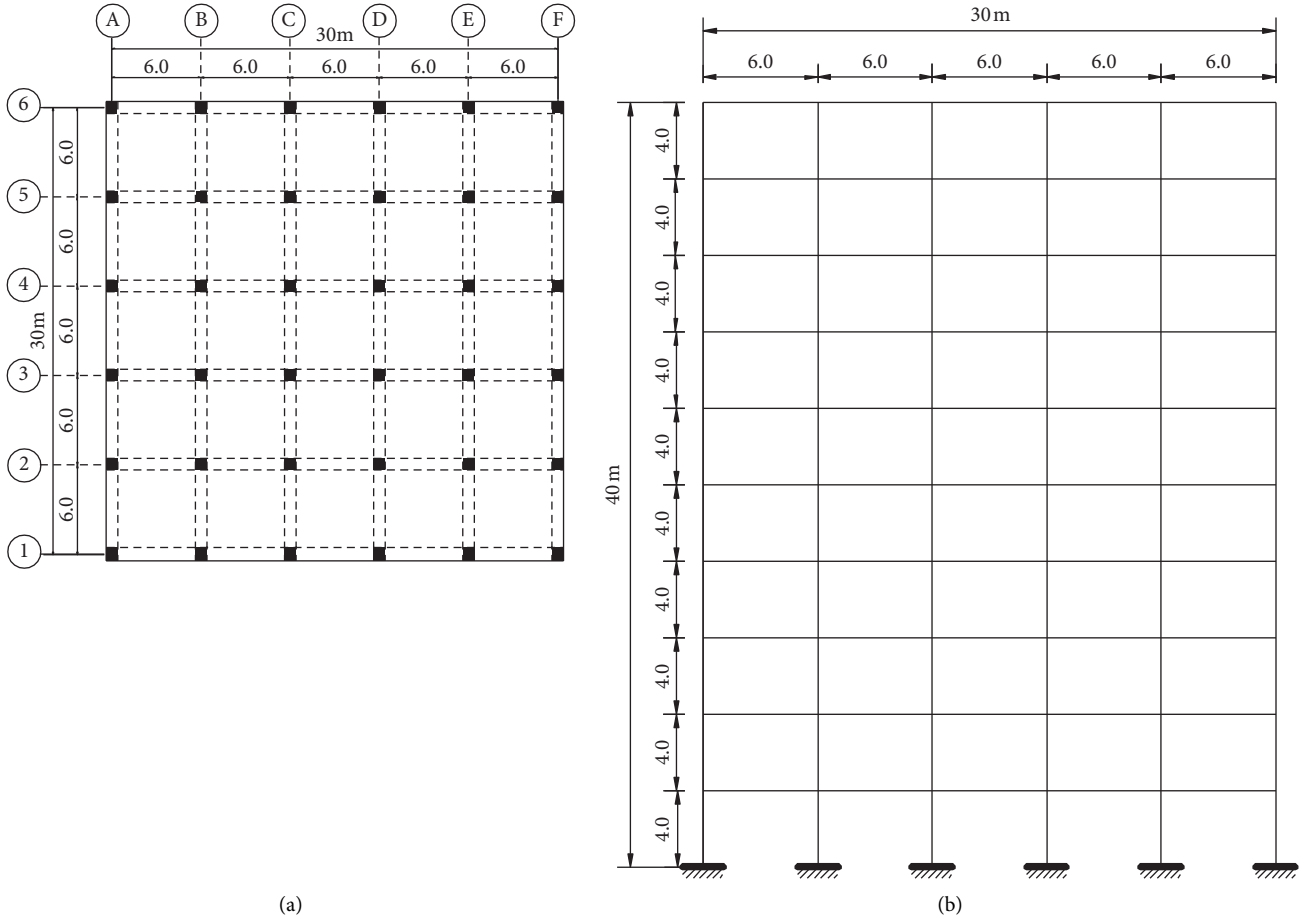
Geometric layout of the reinforced concrete frame structure. (a) Plan view. (b) Elevation.
